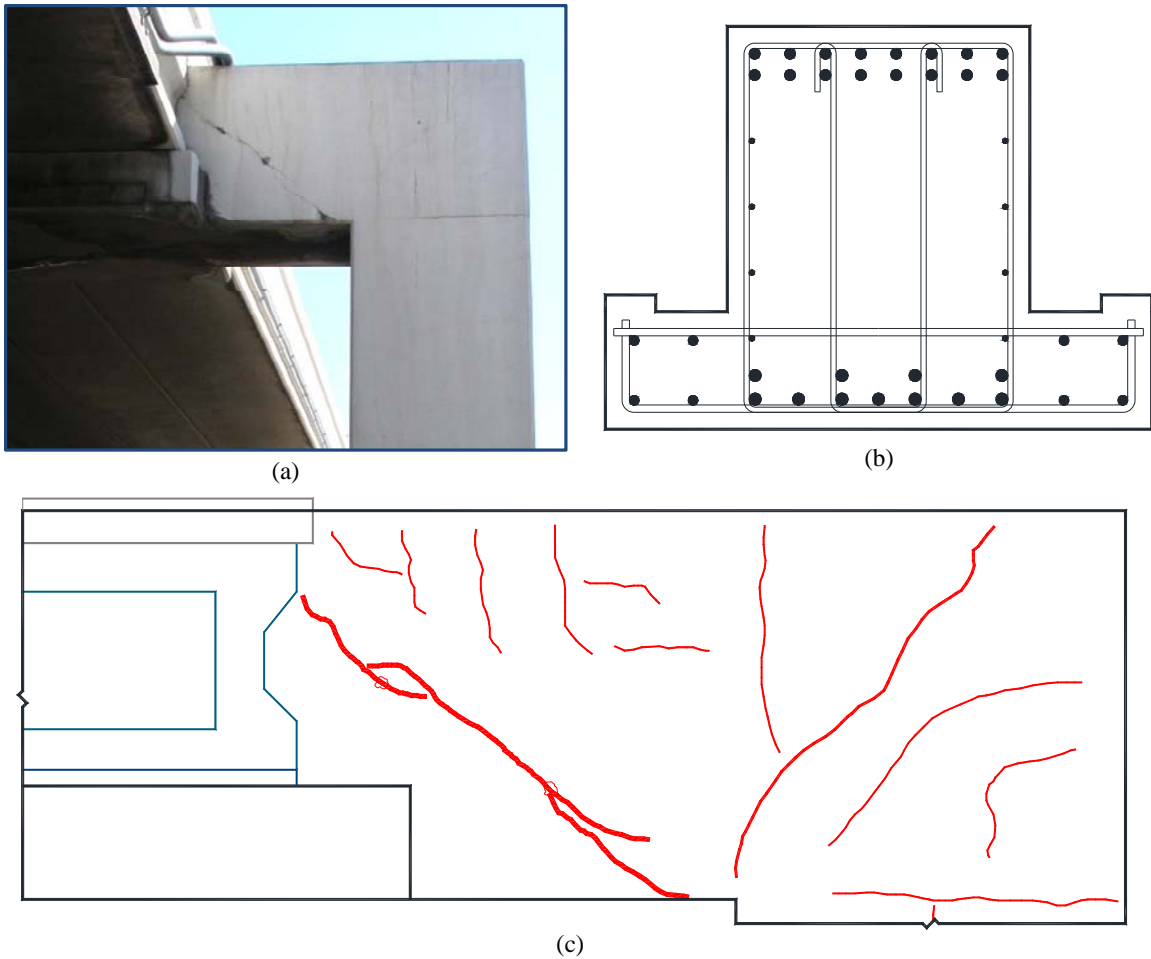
Cracked inverted-T beam in El Paso, TX; (a) inspection photograph, (b) typical reinforcement details, and (c) mapped cracks
